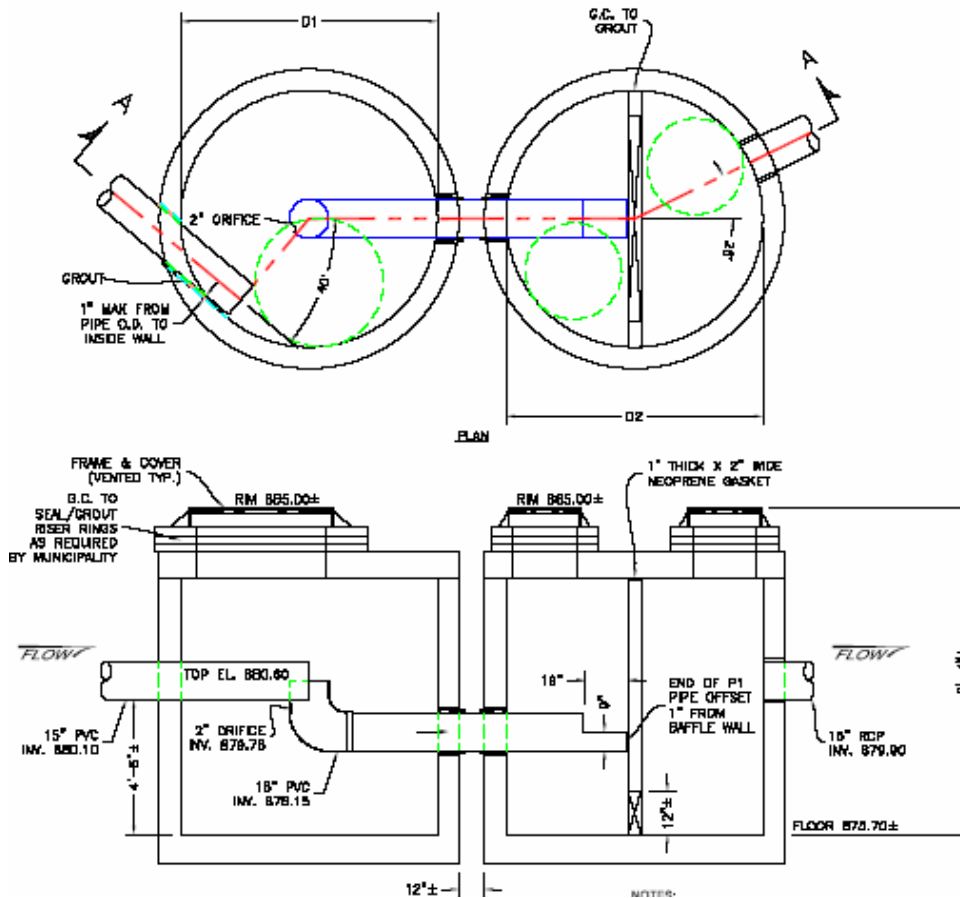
Plan and section of V2B1 Model 4, dual manhole stormwater treatment device installed at Rice Creek Road & Long Lake Road, New Brighton, MN
